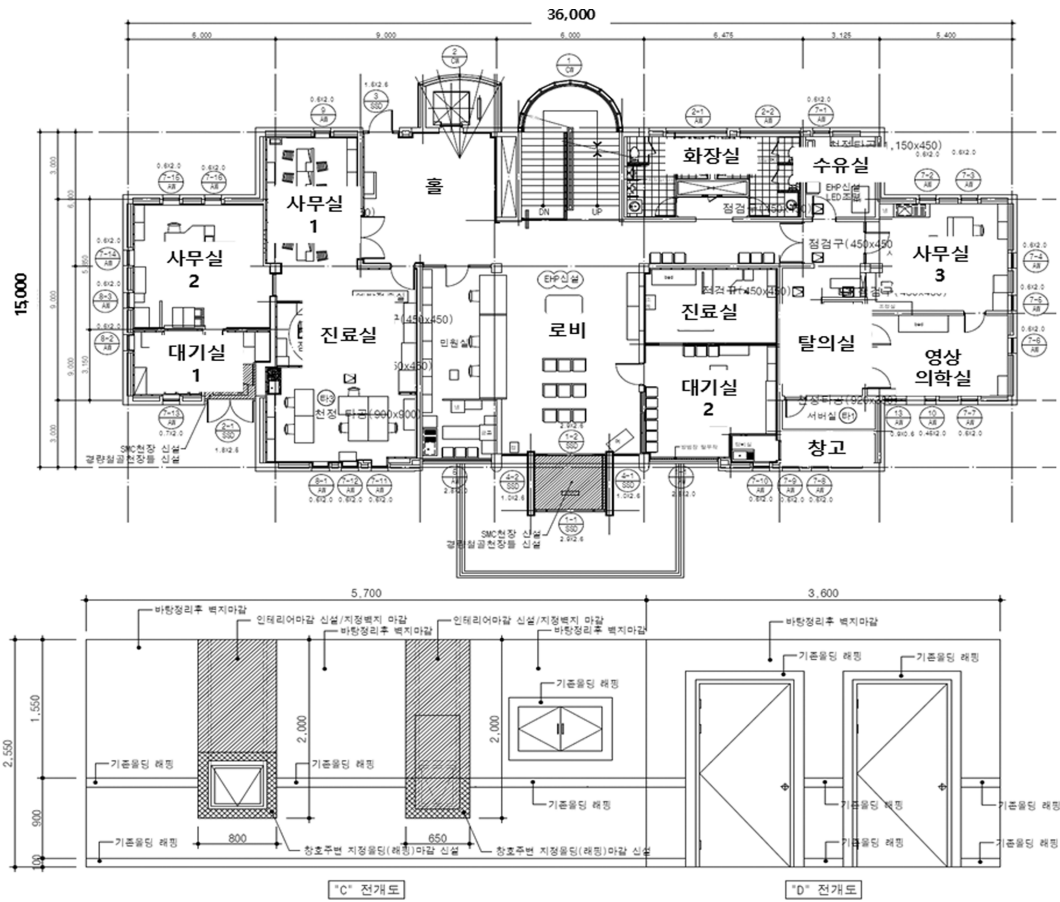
Example of reference floor plan and Green-remodeling wall envelop details
